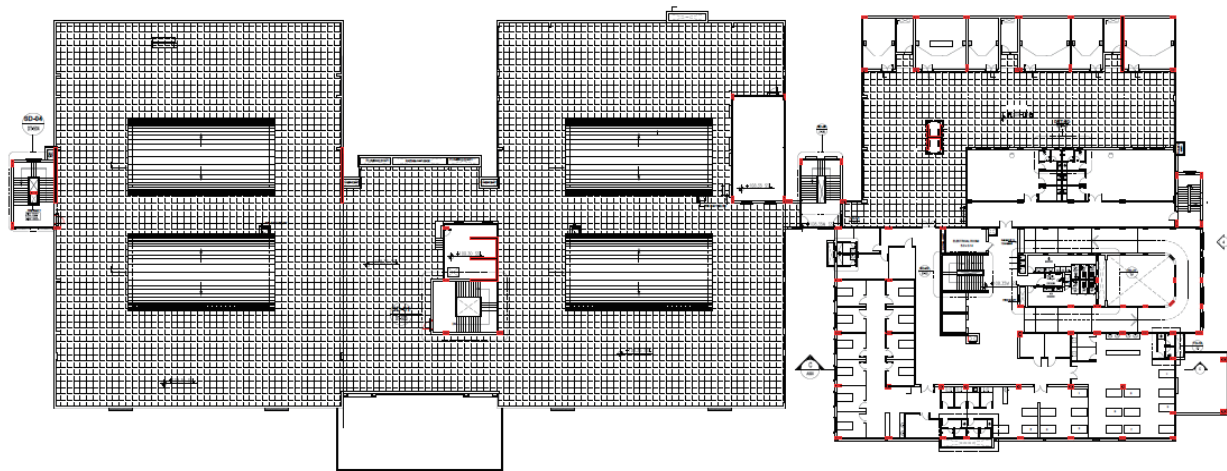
Second floor plan of trauma Centre, JNMC, Aligarh
